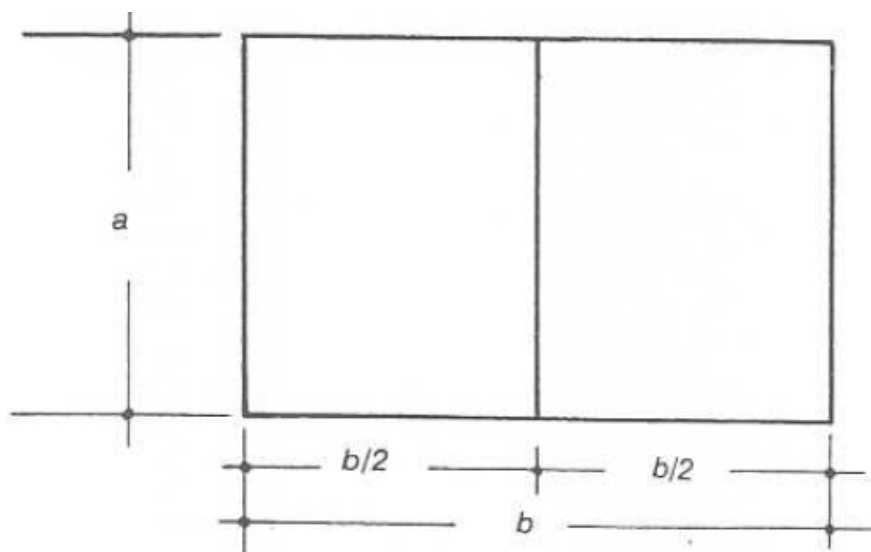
General geometric plan features of the double-containment tanks considered for the study
